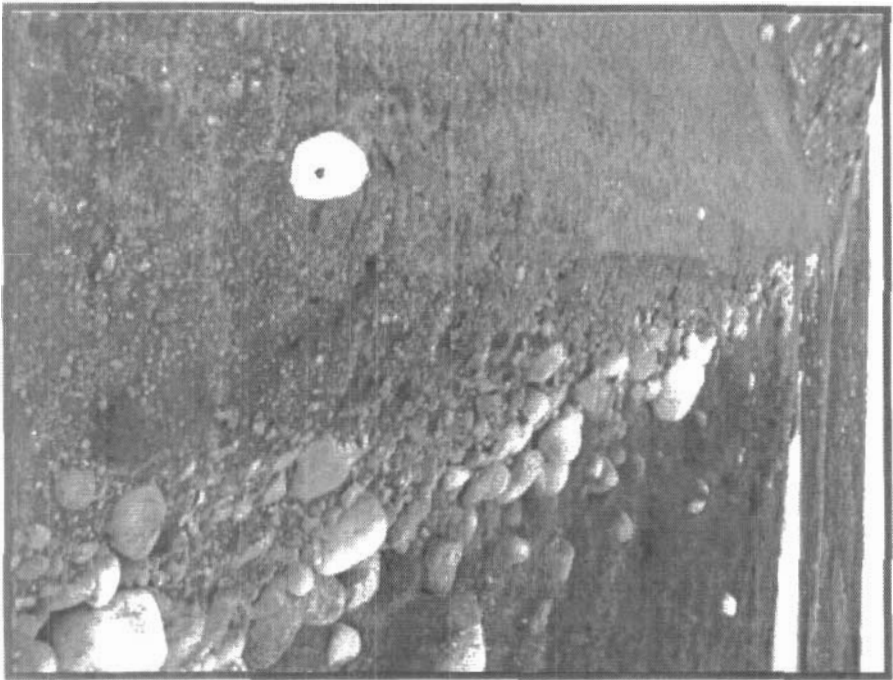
shows some minor cracking along the downstream toe. This cracking has been previously noted.
